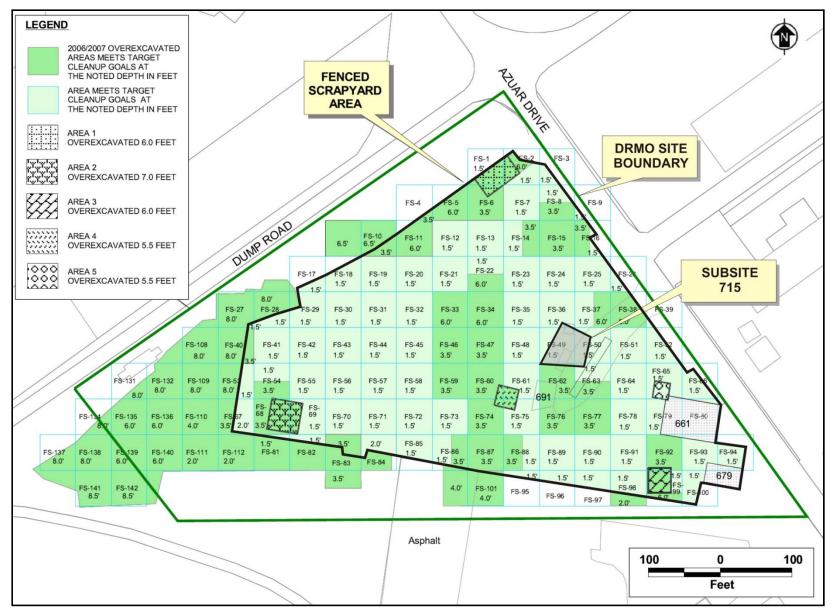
Site Map Detailing the Non-Time Critical Removal Action Excavation Area (Weston Solutions, Inc., 2008)
